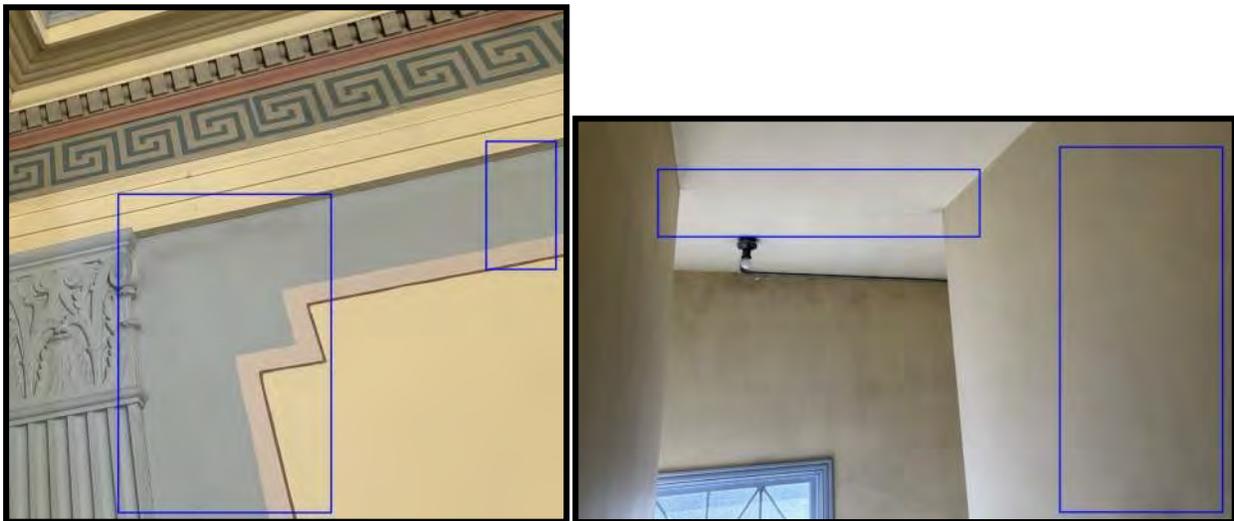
View of hairline cracks in the second-floor rooms and stairways highlighted in the previous figure.
